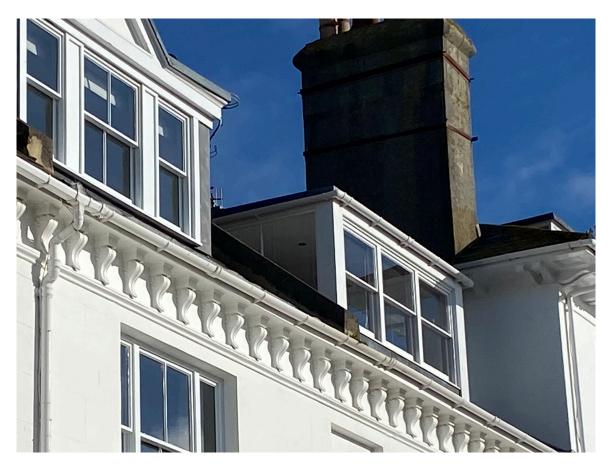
View of glazed flank elevation to dormer on Clifton Terrace.
